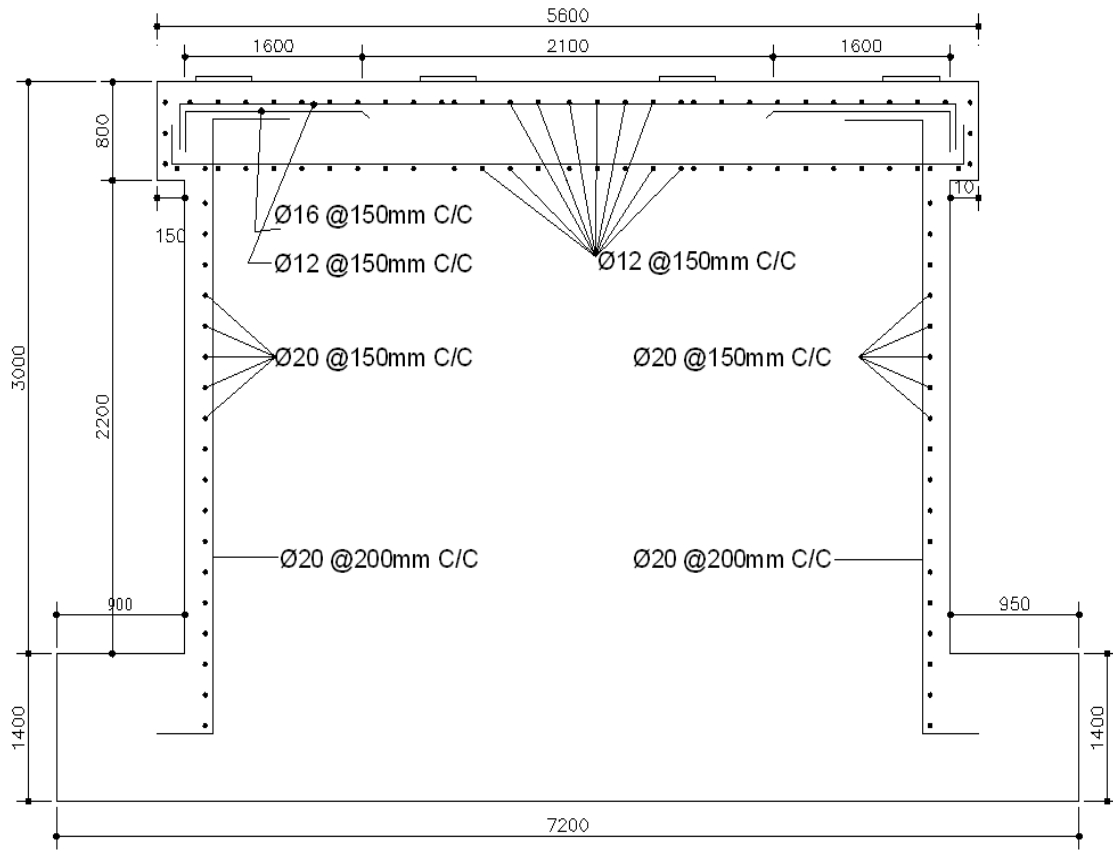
Reinforcement details in Bridge pier 1990-2000 Pile
